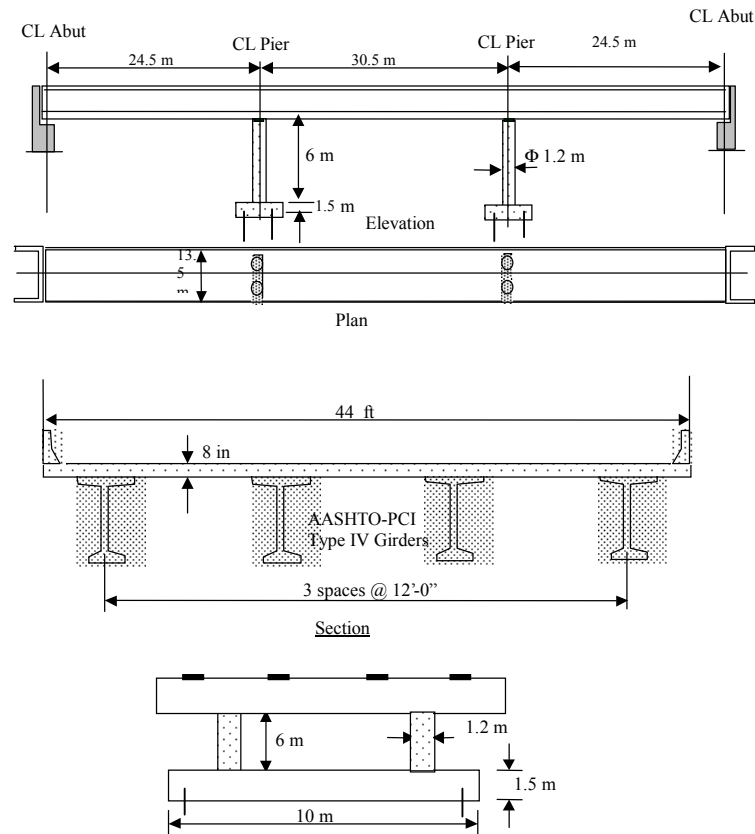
Plan, elevation, and sections of seat-type abutment example.
